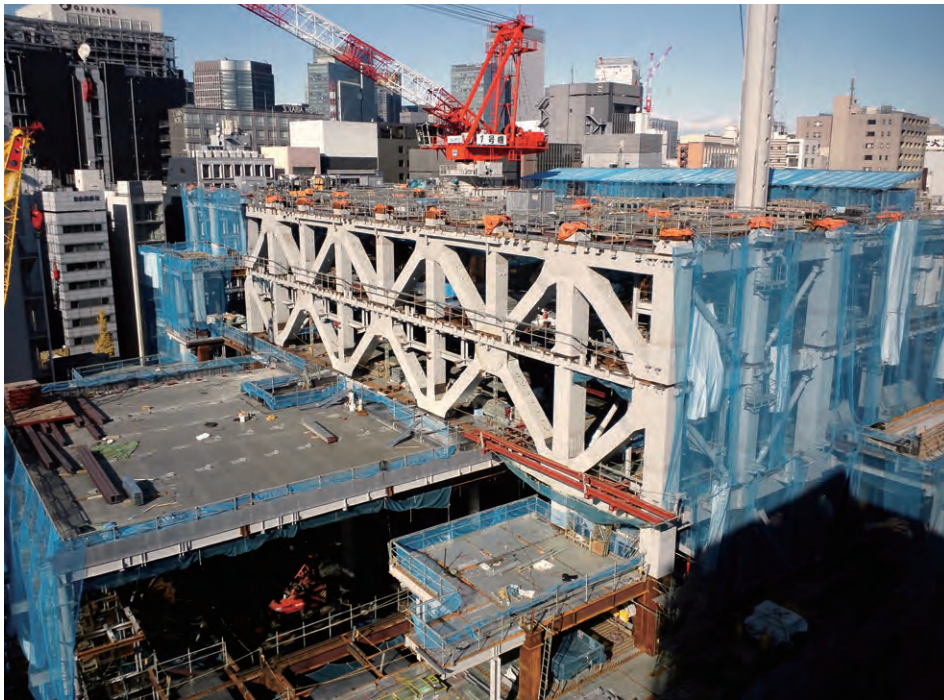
Mega truss structure provided as the switchover structure between the theatre and high-rise office tower
